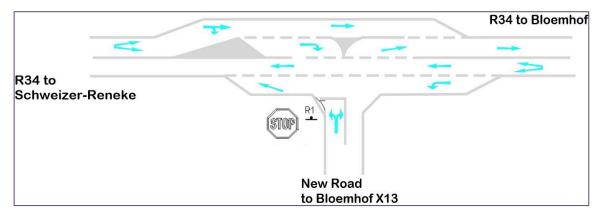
Recommended Intersection Configuration of R34 and proposed access road to Bloemhof Ext 13
